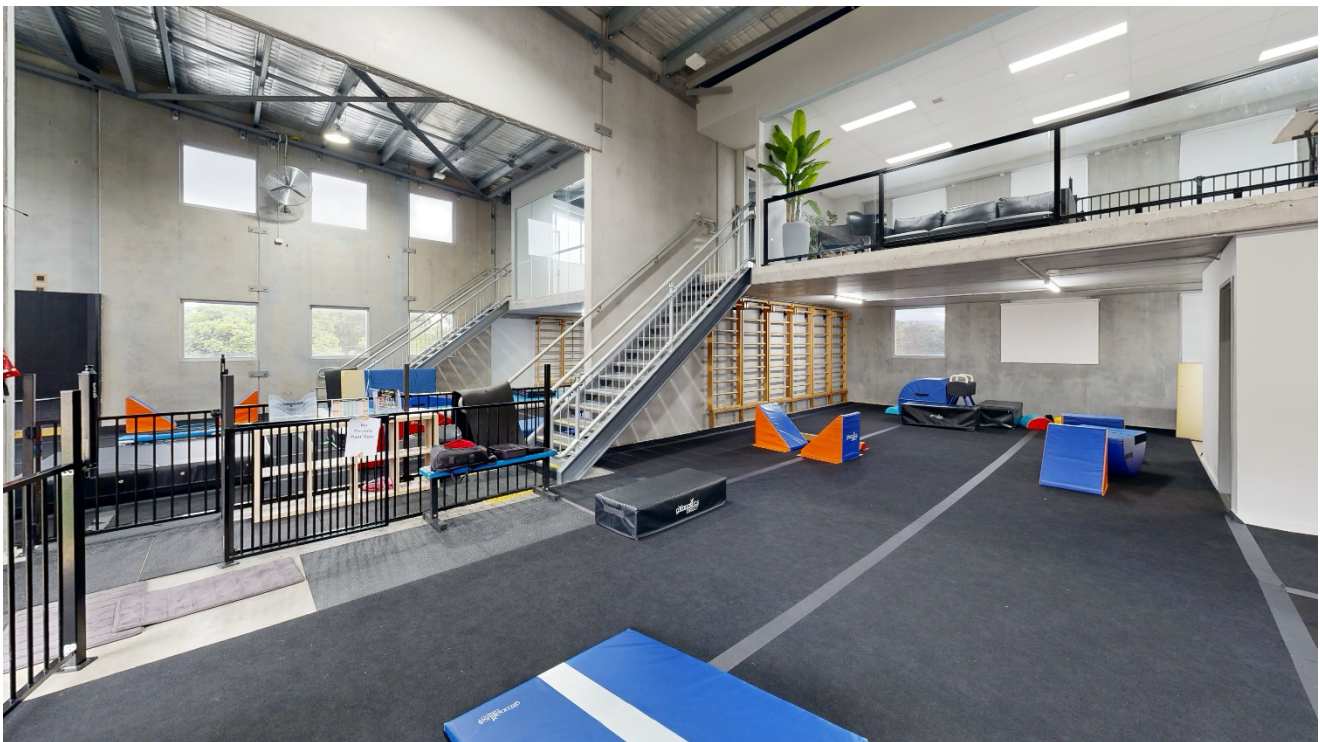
View of Unit 1 (Left) & Unit 2 (Right) interior; wall removed and glass balustrade added to mezzanine in Unit 2 ("PT.5)
